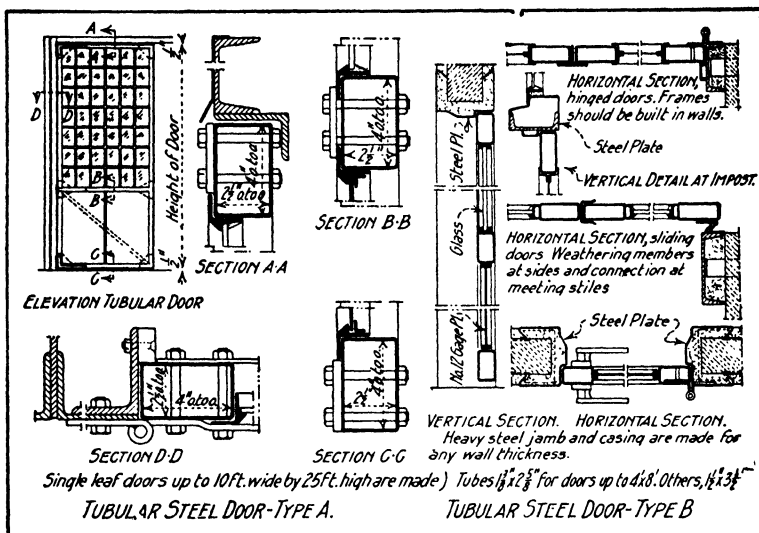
DETAILS OF "LUPTON" TUBULAR STEEL DOORS.
